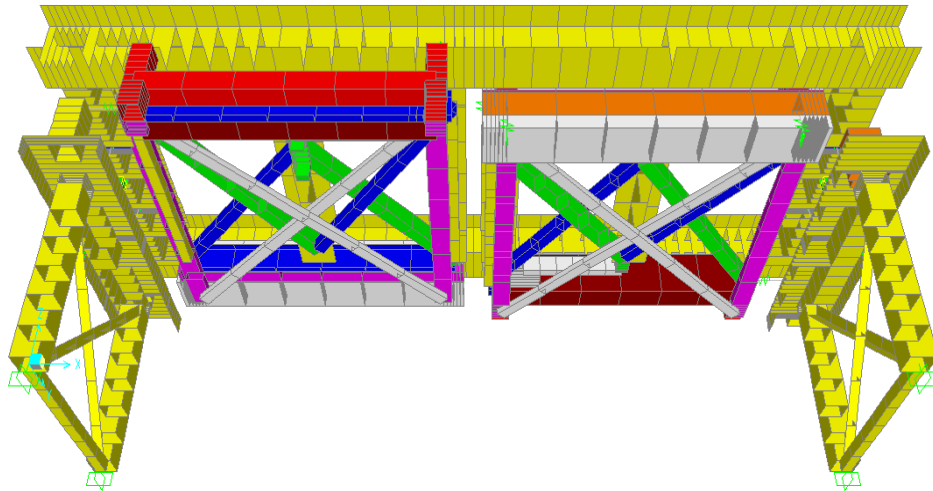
Detailed 3D finite element model of bridge structure with two NSDs below bridge deck
